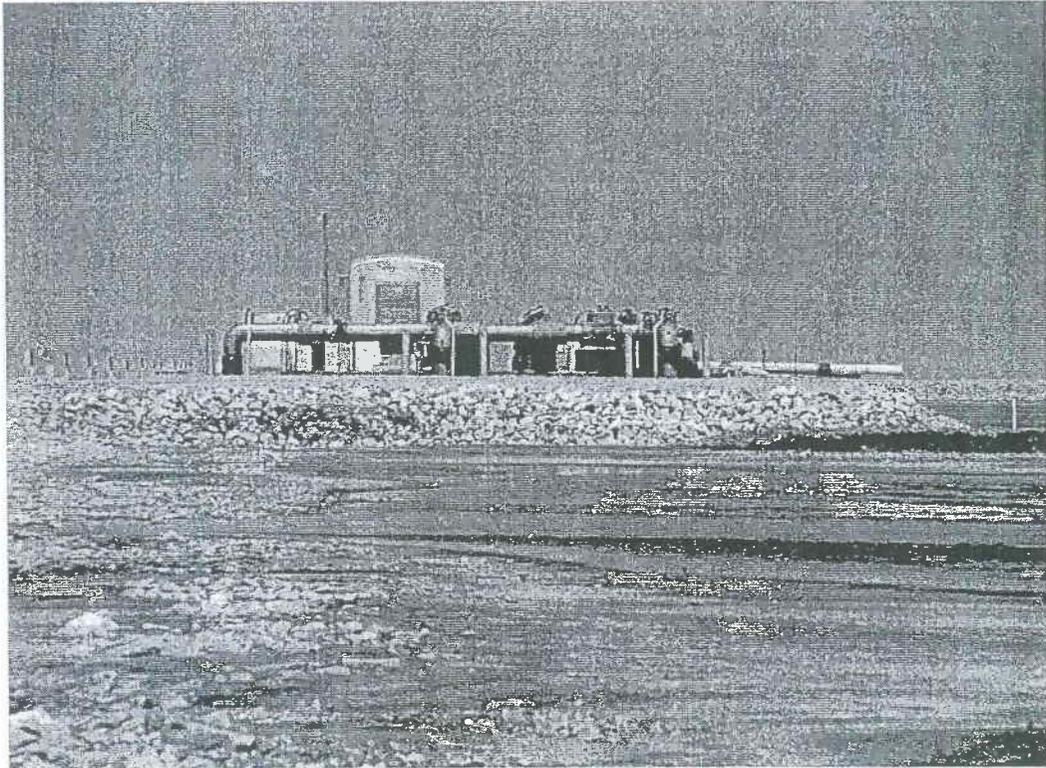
Shallow Flooding – raised equipment pads with armored berms
